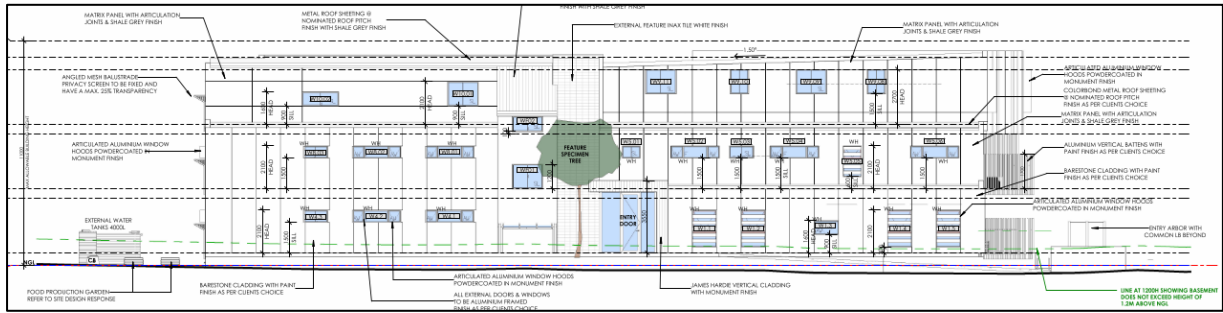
(Above): Southwest elevation showing presentation to land at 36 Barrabool Road. Source: Application documents.
